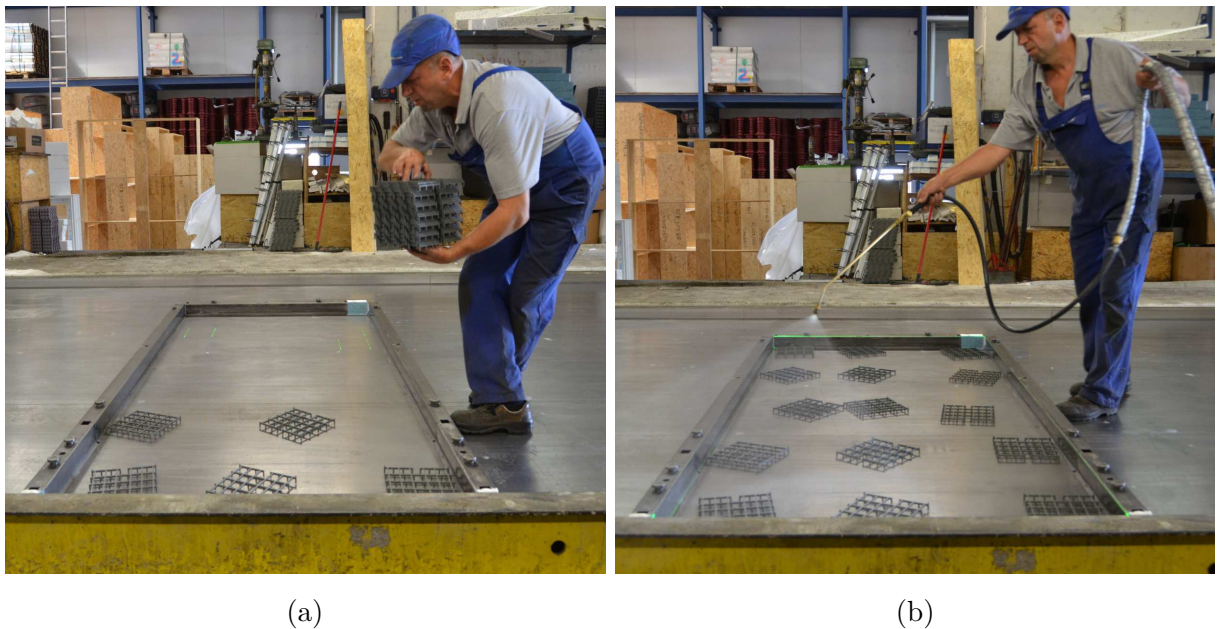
Placing of the spacers and spraying of oil layer on working pallet; (a) placing of plastic spacers; and (b) oiling of the pallet
